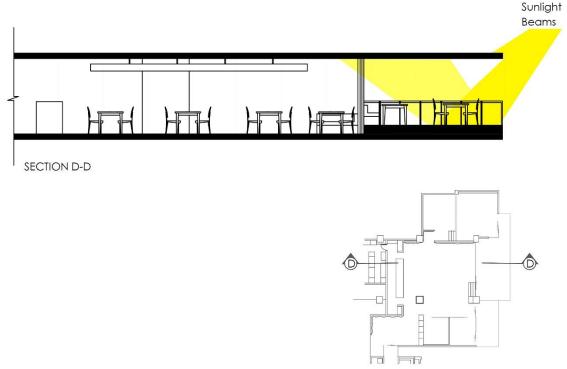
Sectional drawings show the reflection of direct sunlight shaded from the lower ceiling height of opened dining area into the space.
